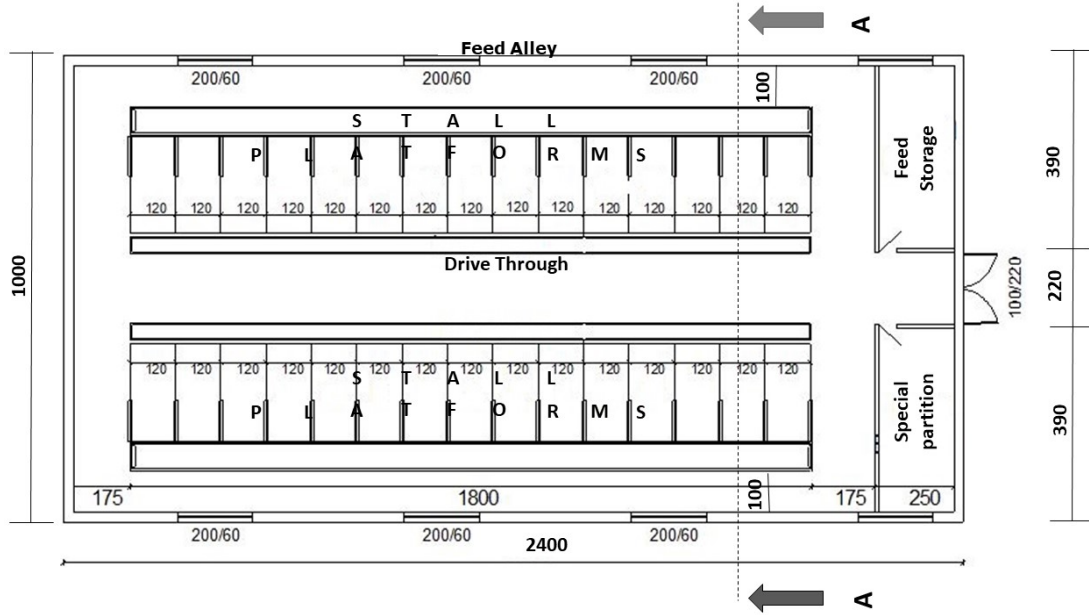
The floor plan of 30-headed prefabricated barn with lightweight concrete
